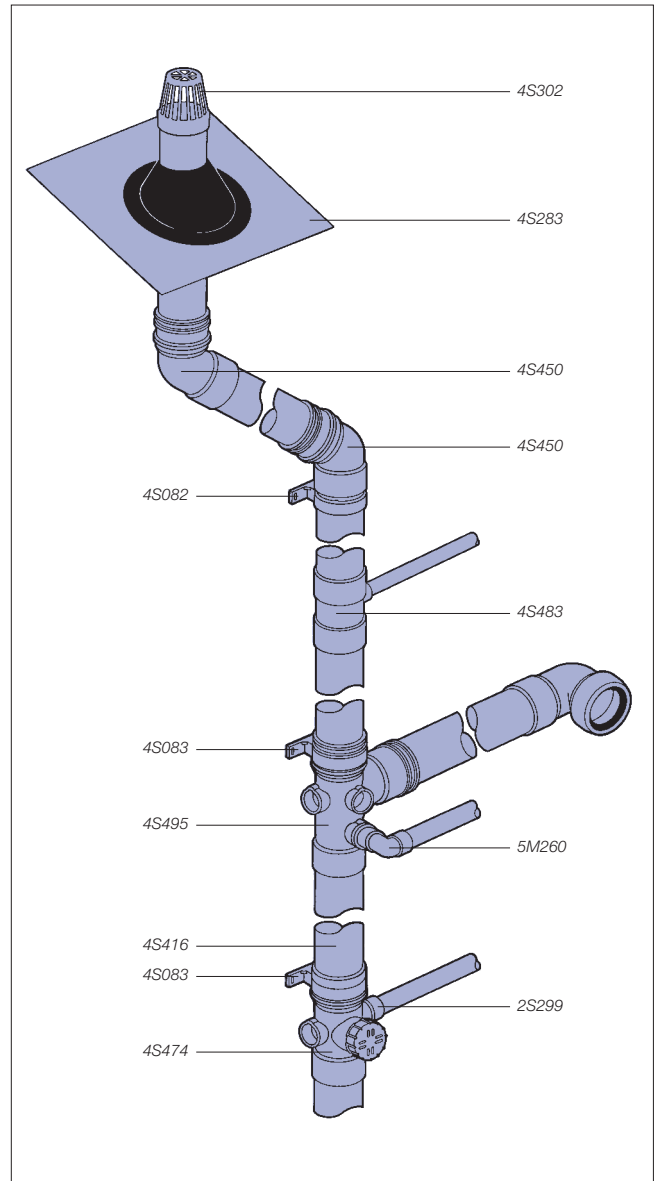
Typical stack assembly – Solvent Weld system
